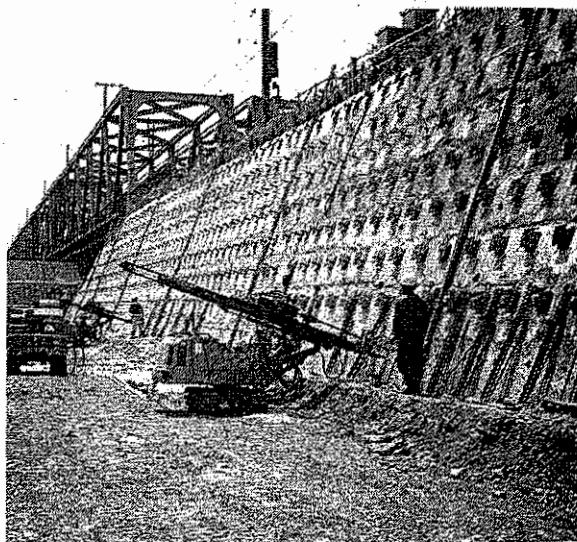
In-situ mixing work from near the crest of slope, Tsukamoto.
